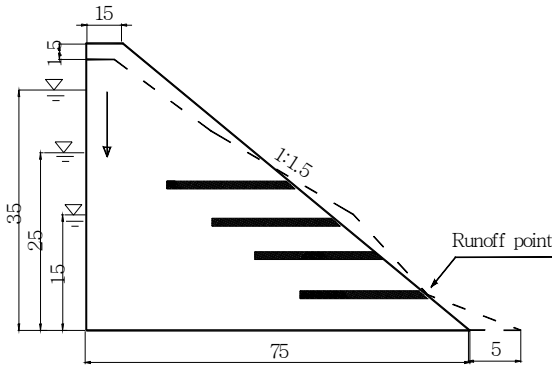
Reinforced embankment failure in granite soil(Dr=40%, 1:1.5, Fast rising)
